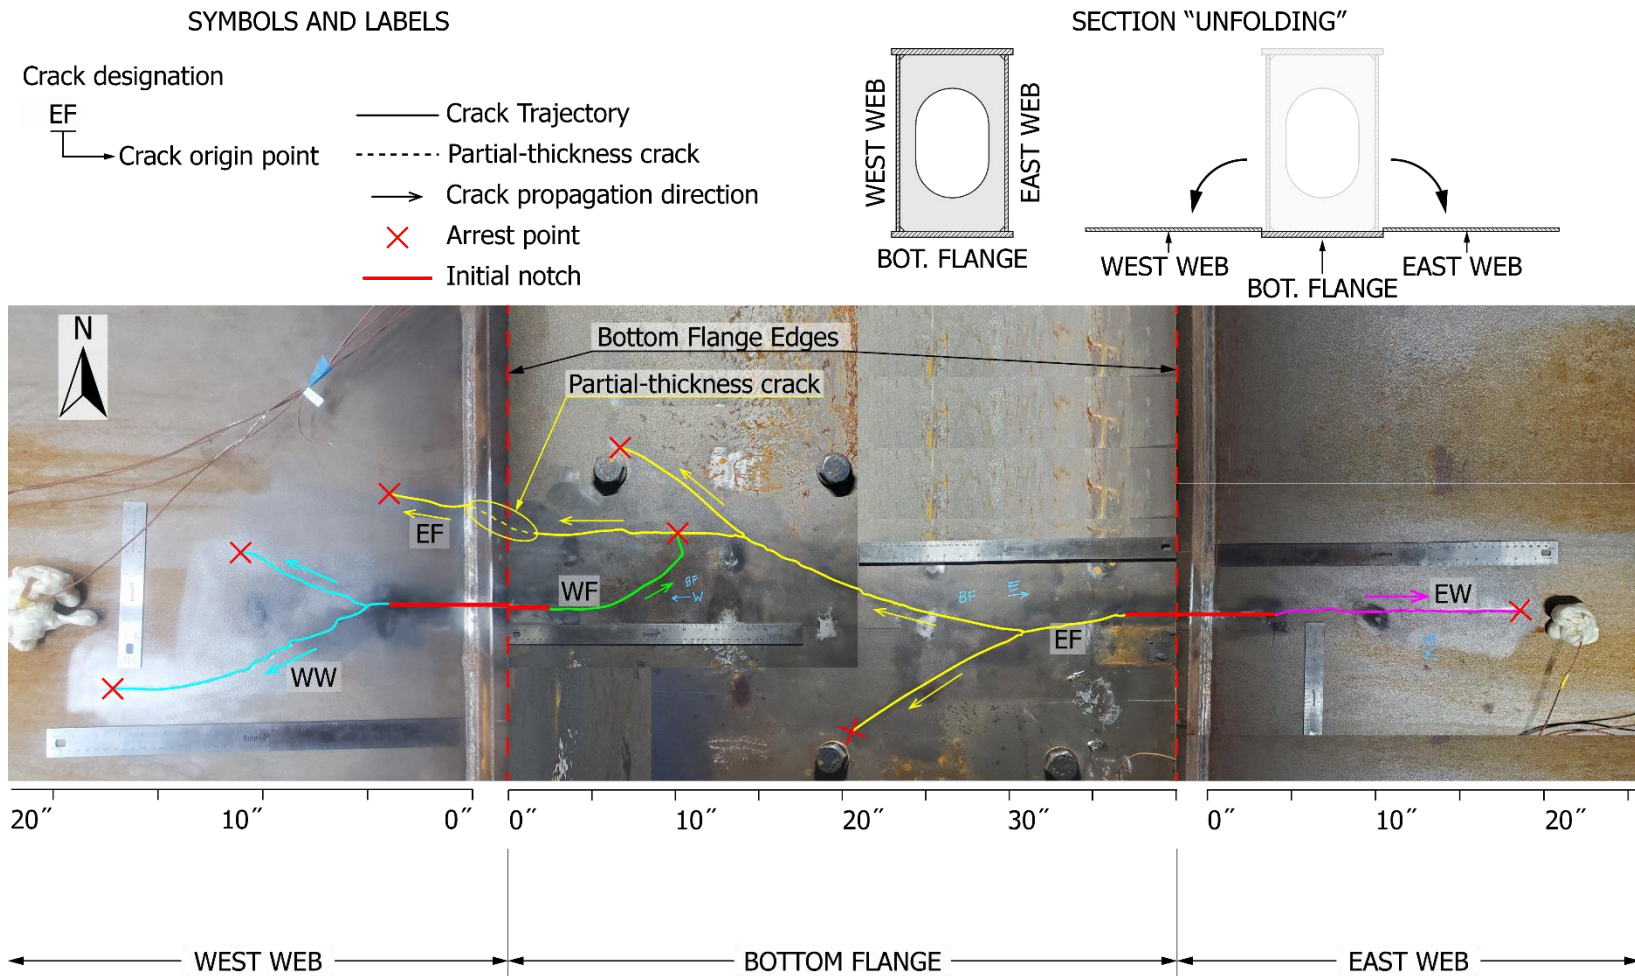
Specimen A: cracks after completion of Fracture Test
